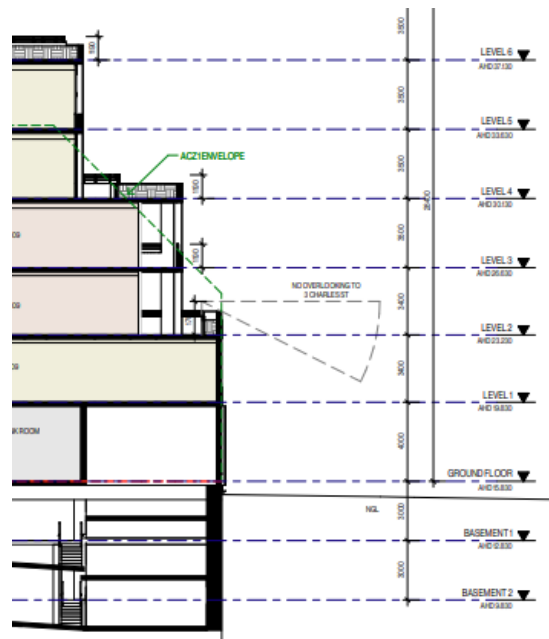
Overlooking diagram facing 3 Charles Street (Source: Application)
